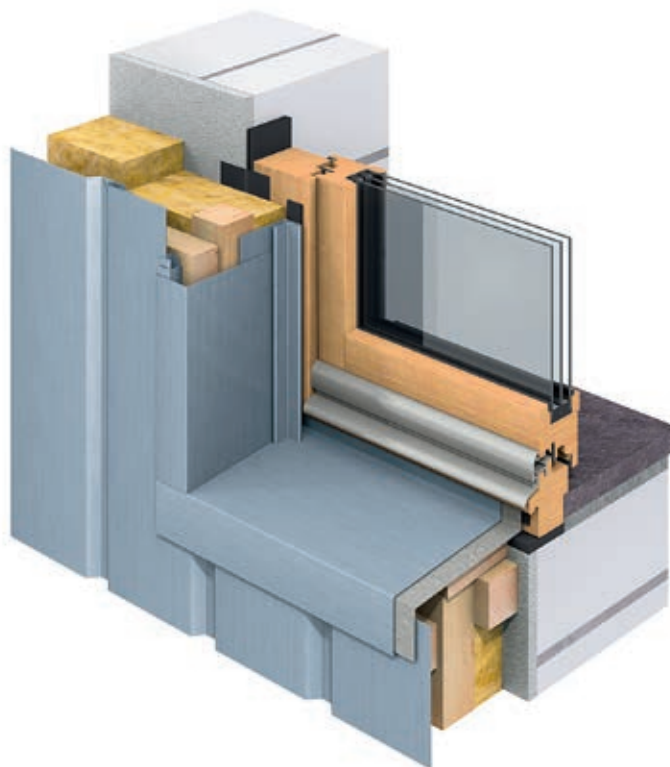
Connection of window sill to RHEINZINK-SP-Line facade
